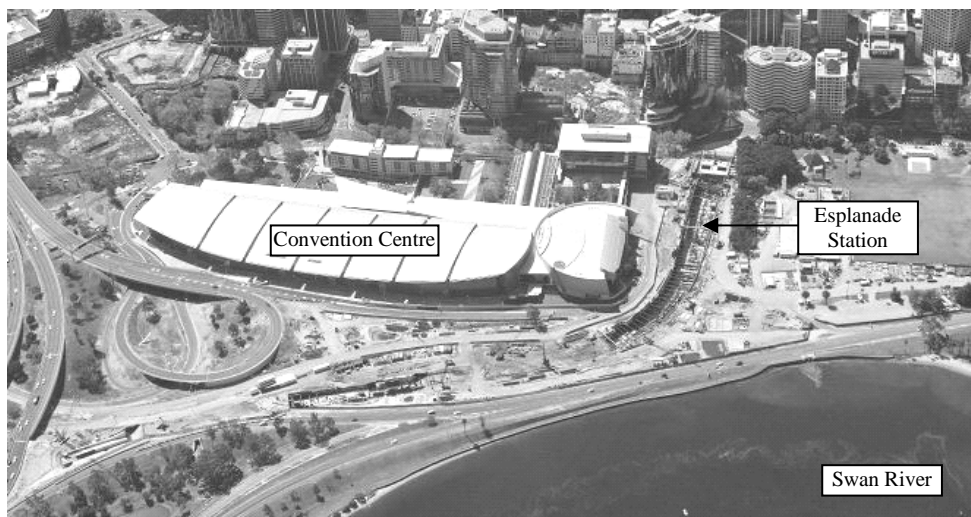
Esplanade Station and cut and cover tunnel works adjacent to the Convention Centre and Swan River.
